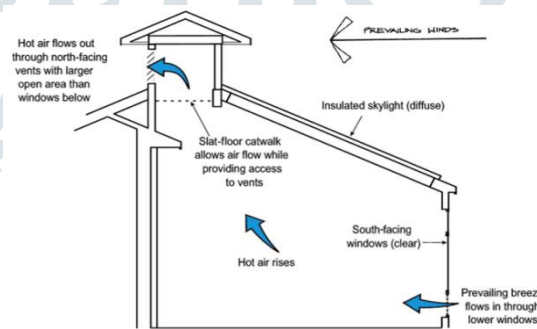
Solar Chimney as Passive Construction Technique in Orchid House
